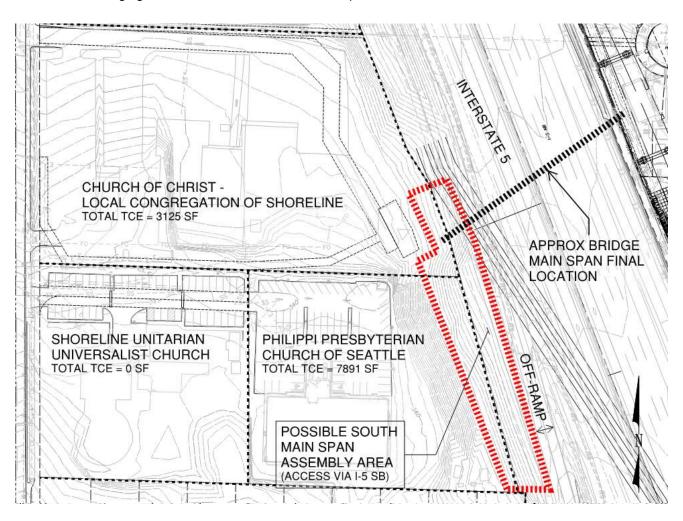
Potential Bridge Construction Staging Area Adjacent to the Philippi Church Parcel
